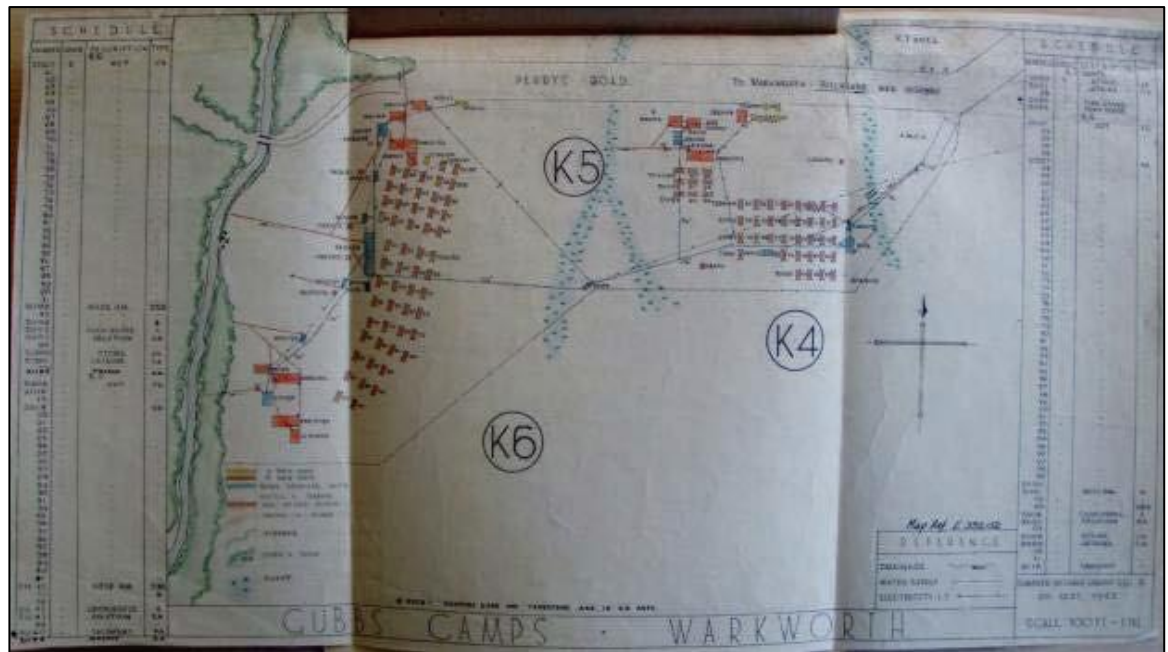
Plan detailing the layout of Gubbs Camps K4, K5 and K6, situated along Perry Road (source: Archives New Zealand, ACIO 8722, 6/ 79/4)
